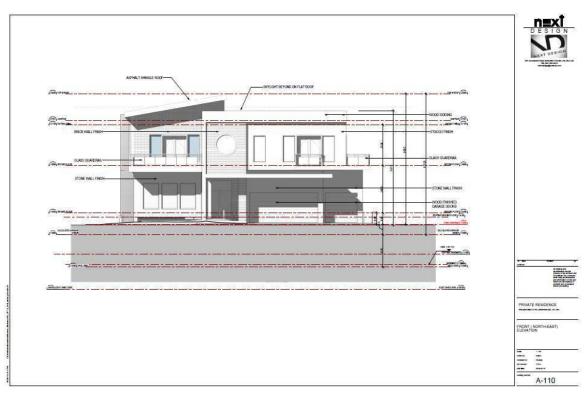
Proposed residence at 2560 Mindemoya Road, front or northeast elevation. (Image from Next Design Group, April 2018.)
